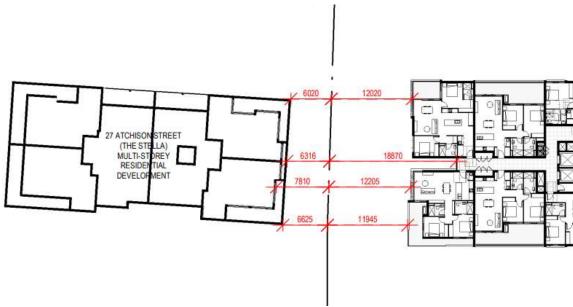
Separation distances between residential units and 27 Atchison Street (L6-7 Typical)
